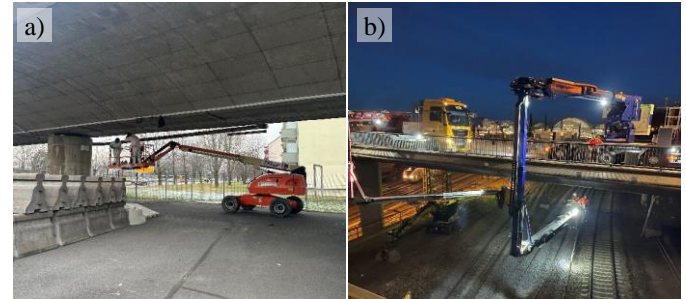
Examples of the special equipment for sensor installation: a) lifting platform, b) under-bridge inspection device
